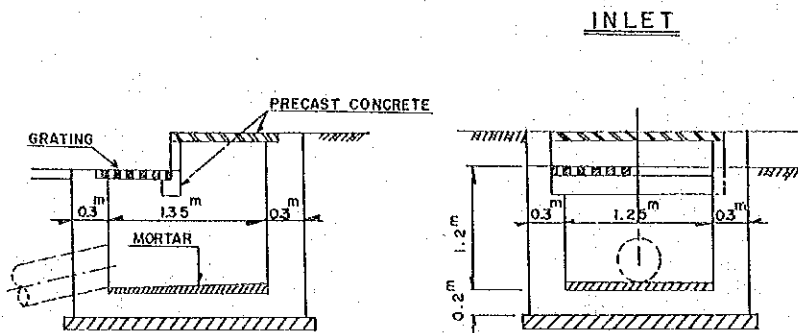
(3/3) STANDARD DRAWINGS OF PROPOSED STRUCTURES FOR FIRST STAGE PROJECT
